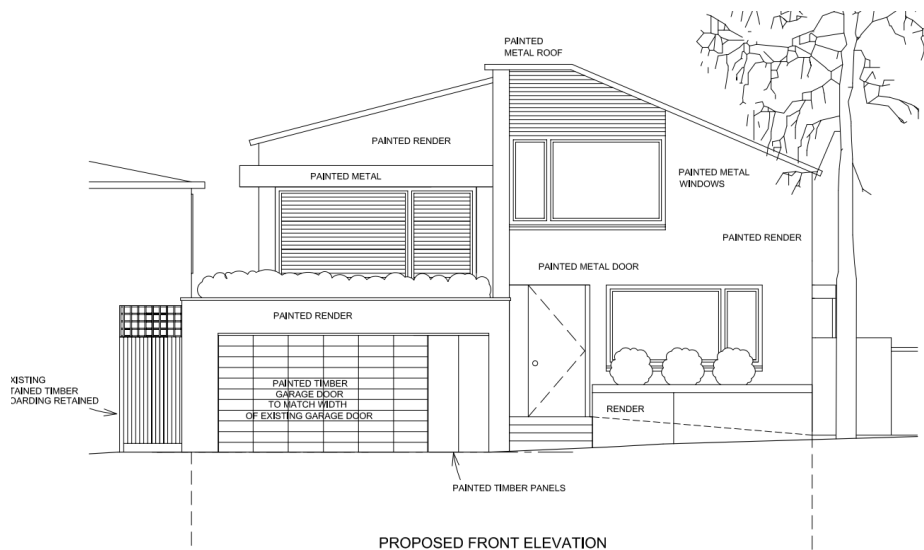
Extract of proposed front elevation approved under ref: 2017/6700/P
